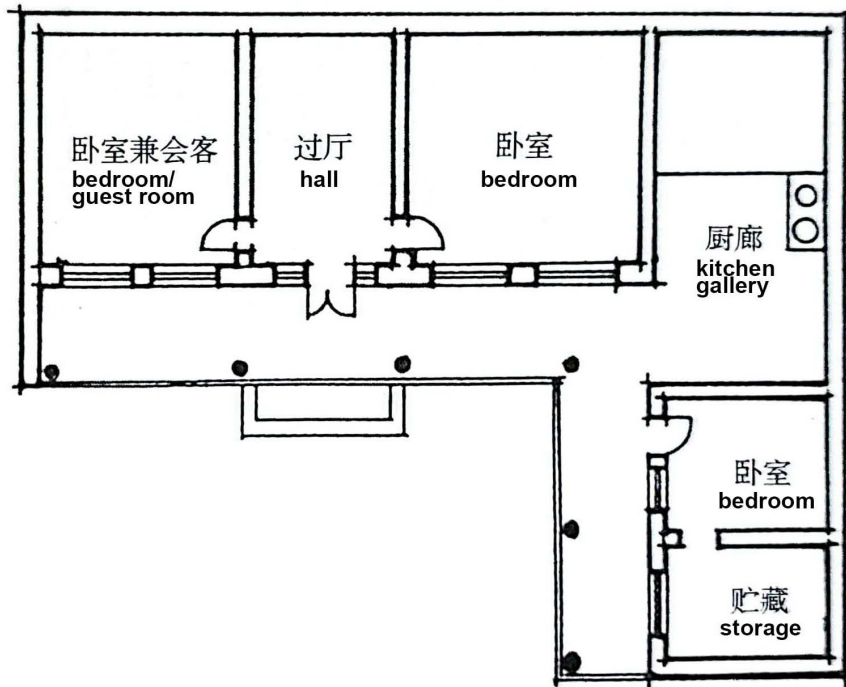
Floor plan of an example bent-style (“L” shape) house.³⁶ Translated by author.
